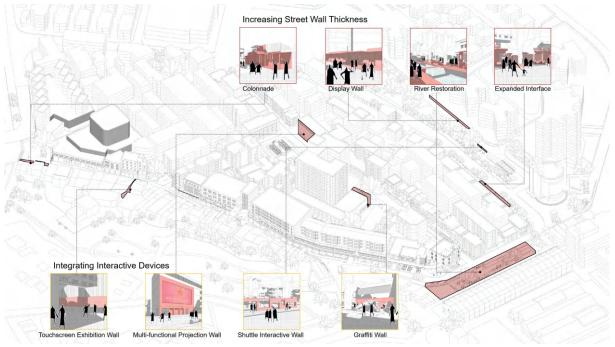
Street walls Carry Public Spaces (Source: Drawn by the Author)
